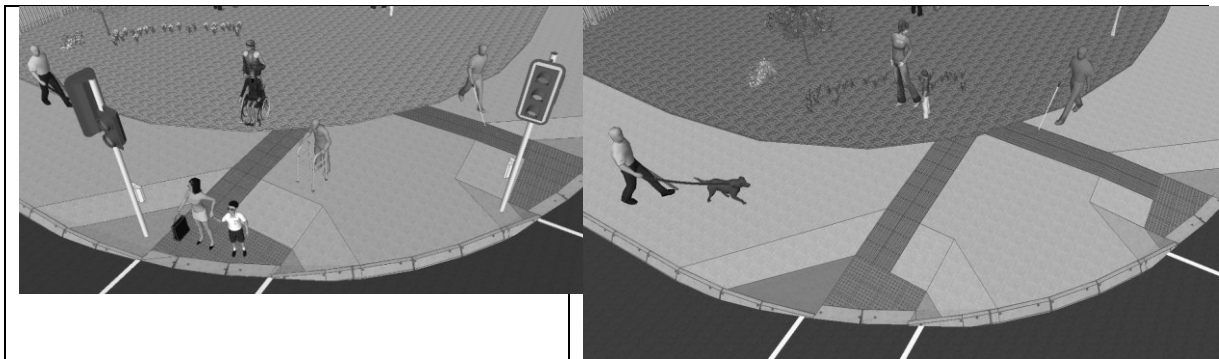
Adapted L-Shaped layouts, large kerb radius
